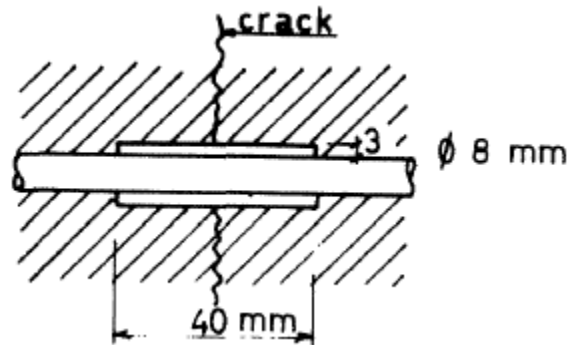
Soft sleeves around the bars Walraven and Reinhardt (*Walraven and Reinhardt 1981*)
